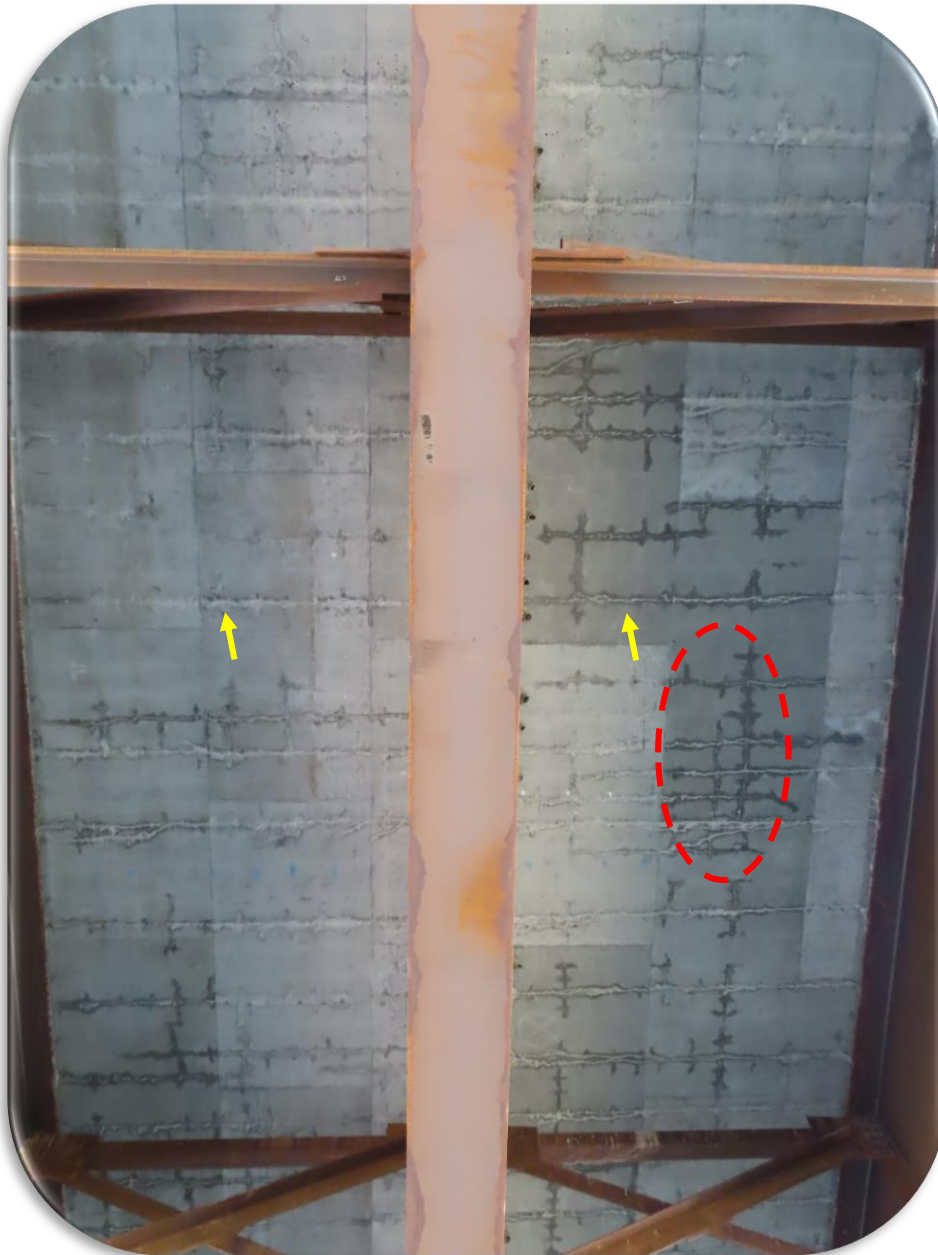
West Laurel Interchange - Phase I - 2020 inspection - Placement 2. Typical transverse crack at arrows. Red dotted oval indicates an area with intersecting cracks.
